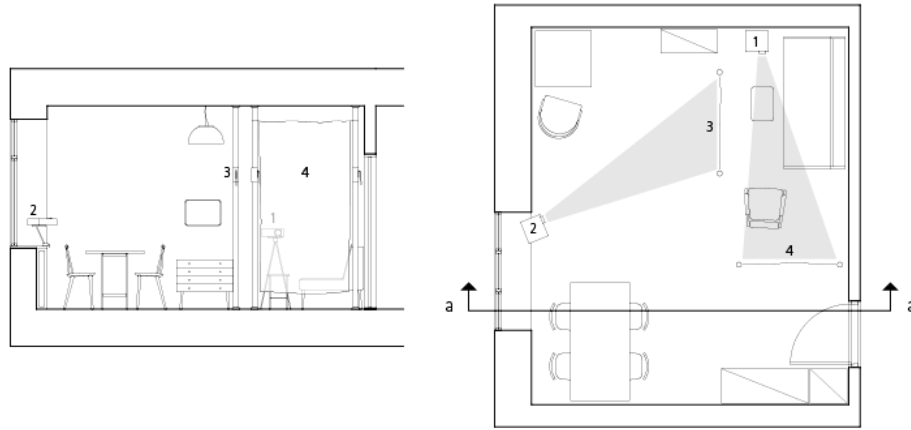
Section a-a and plan of living room showing the projections of EvoCurtain and placement of wall screens.
